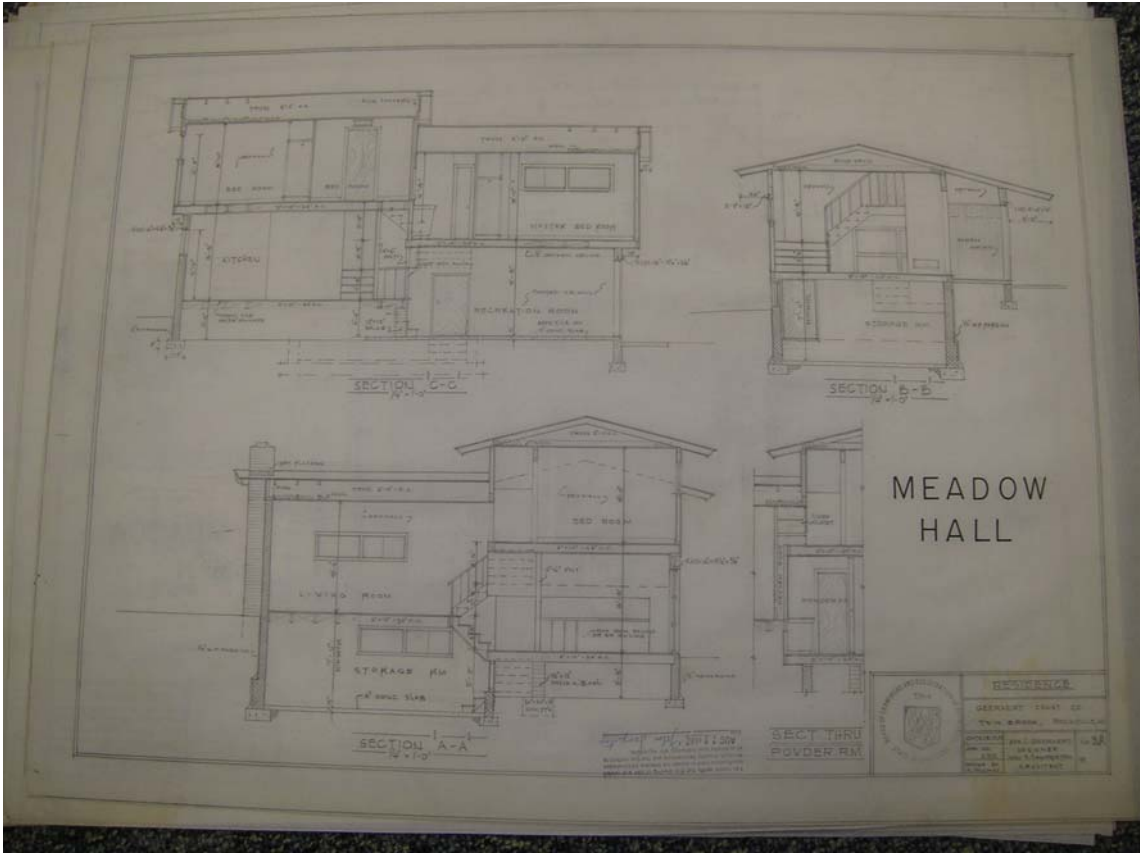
, Meadow Hall Floor Plan from the Twinbrook Archives at Peerless Rockville
